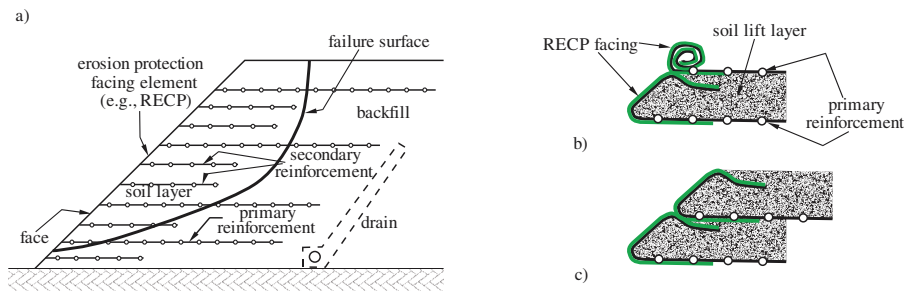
Sketch defining (a) terms for a general reinforced soil slope; (b) individual soil lift layer filled with soil, and another reinforcement element on top yet to be filled—also shown is the primary reinforcement element wrapped around the face together with an appropriate RECP; and (c) two completed soil lifts. (Adapted from NHI-43—see also INDOT Chapter 410.8, Figure 410-8A).
